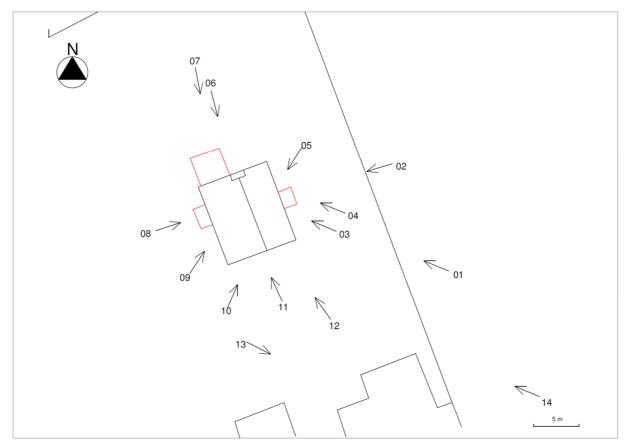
Sketch plan of the house, red lines indicate 20th century additions. Arrows indicate phot locations and orientation.
